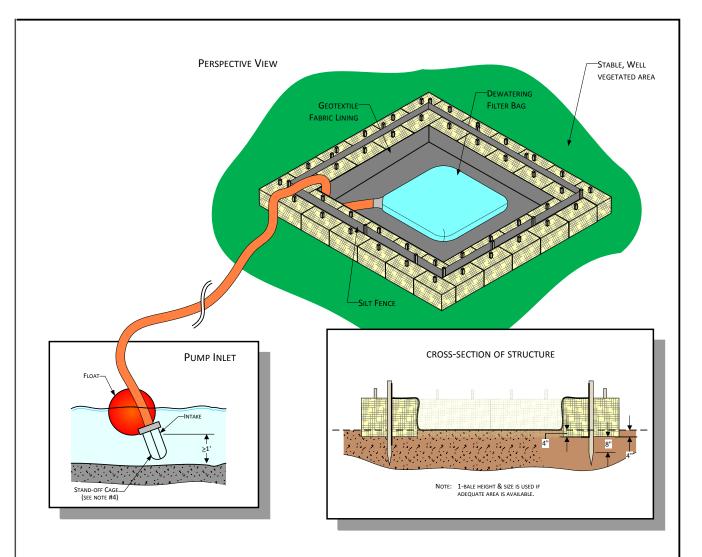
B Environmental Protection Plan Straw Bale Dewatering Structure
